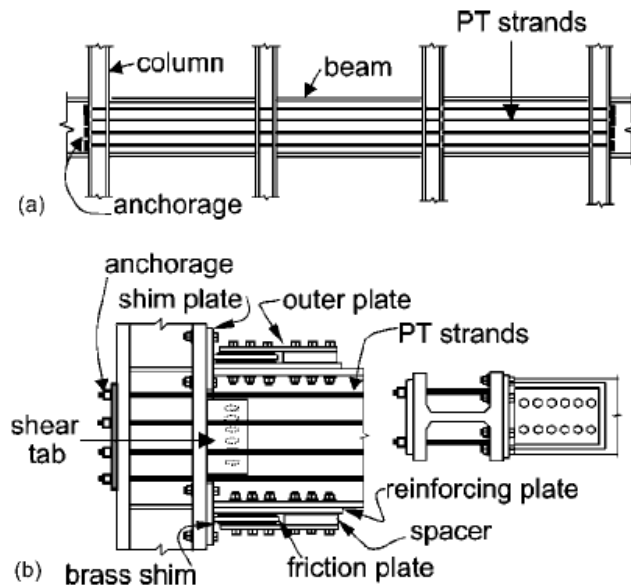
Overview of Frame with Post-Tensioned Friction Damped Connections(top and bottom of beam flange) and Details of Post-Tensioned Friction Damped Connections (Rojas, Ricles, & Sause, 2005)
